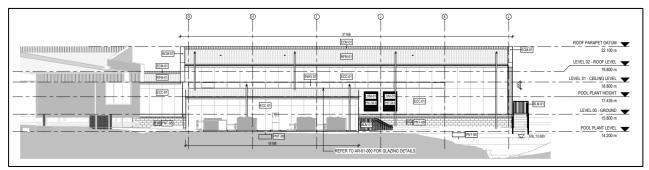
Southern elevation of proposed pool facility (Source: External Elevations Plan, prepared by Populous, 15 December 2023)
